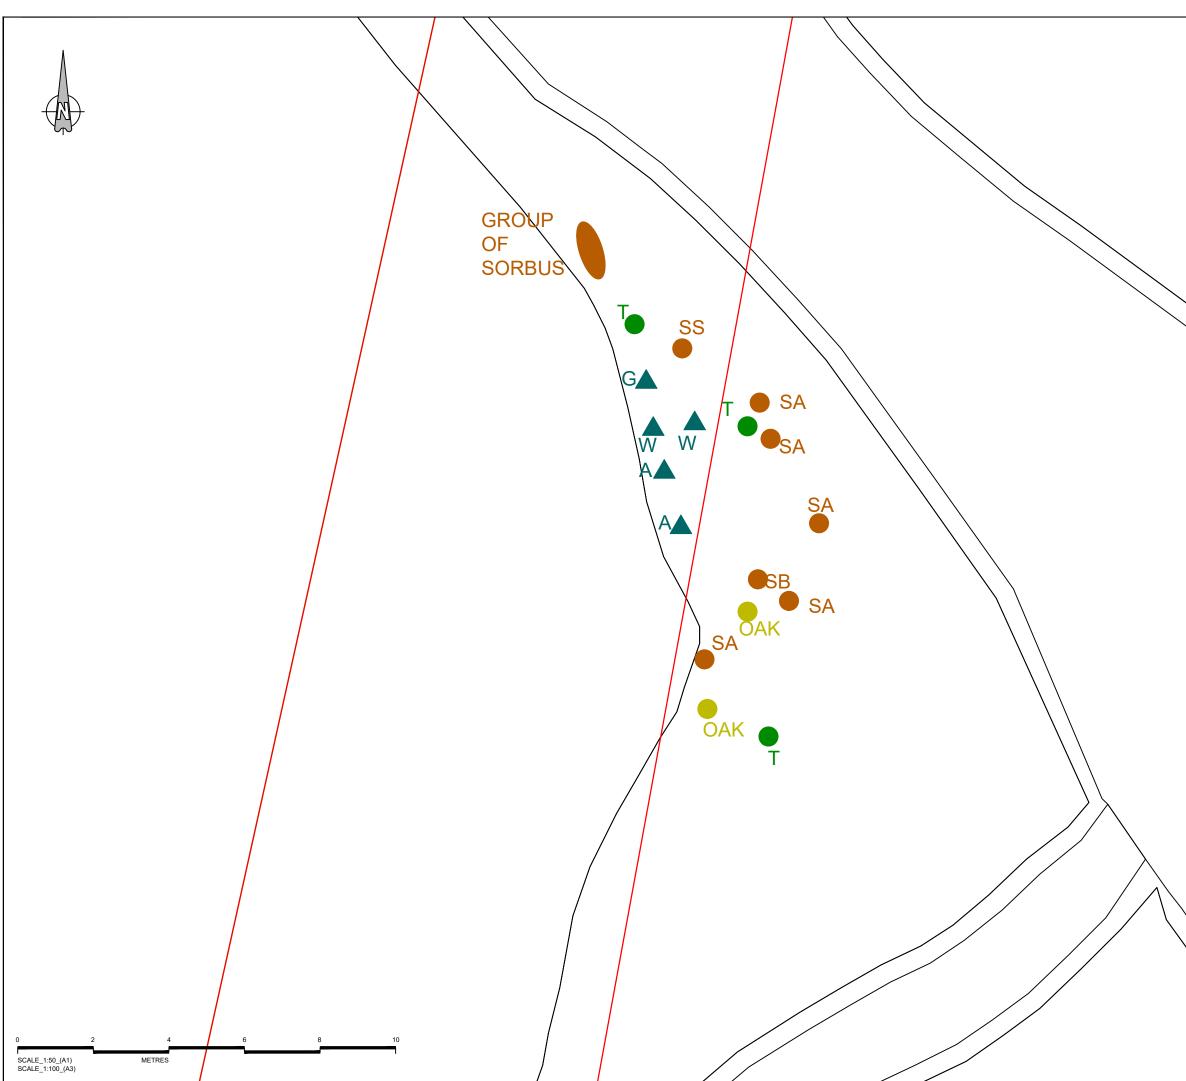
Planting site above Clifton Bridge No. 2 Tunnel (southern end). (NR land ownership is shown in green).
